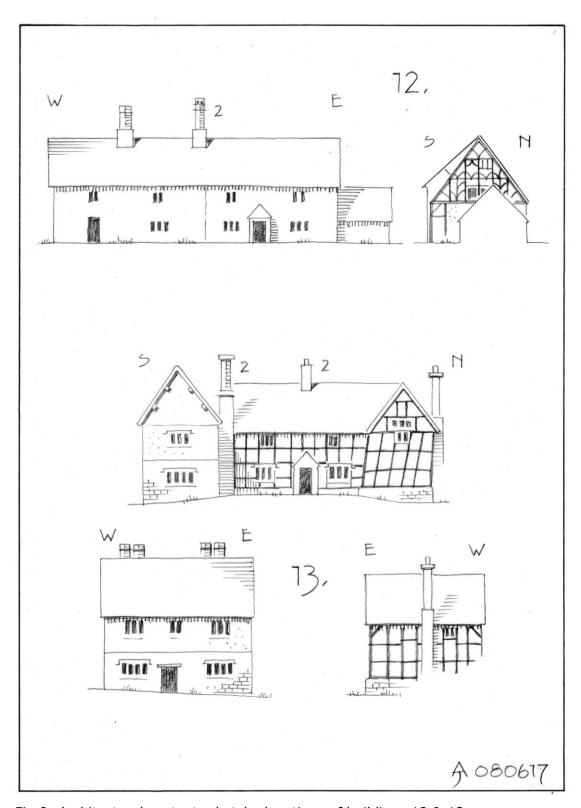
; Architectural context; sketch elevations of buildings 12 &~13
